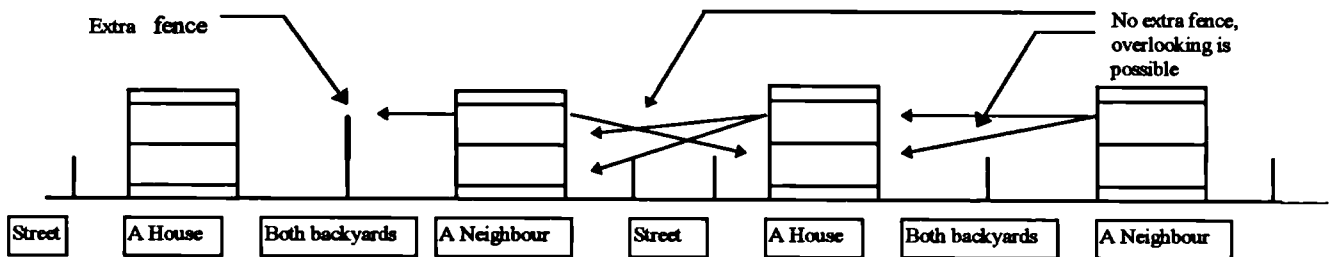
The overlooking protection the extra vertical fence can give to first and ground floor windows, left side, and the exposure of first and ground floor windows to overlooking without an extra vertical fence.
